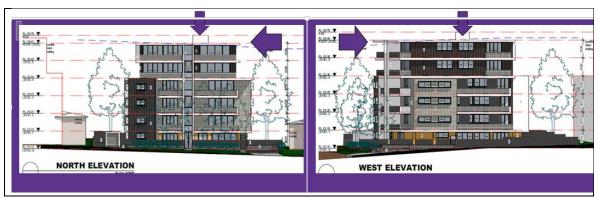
Extract of the section plan showing the building elements which exceed the height limit.
